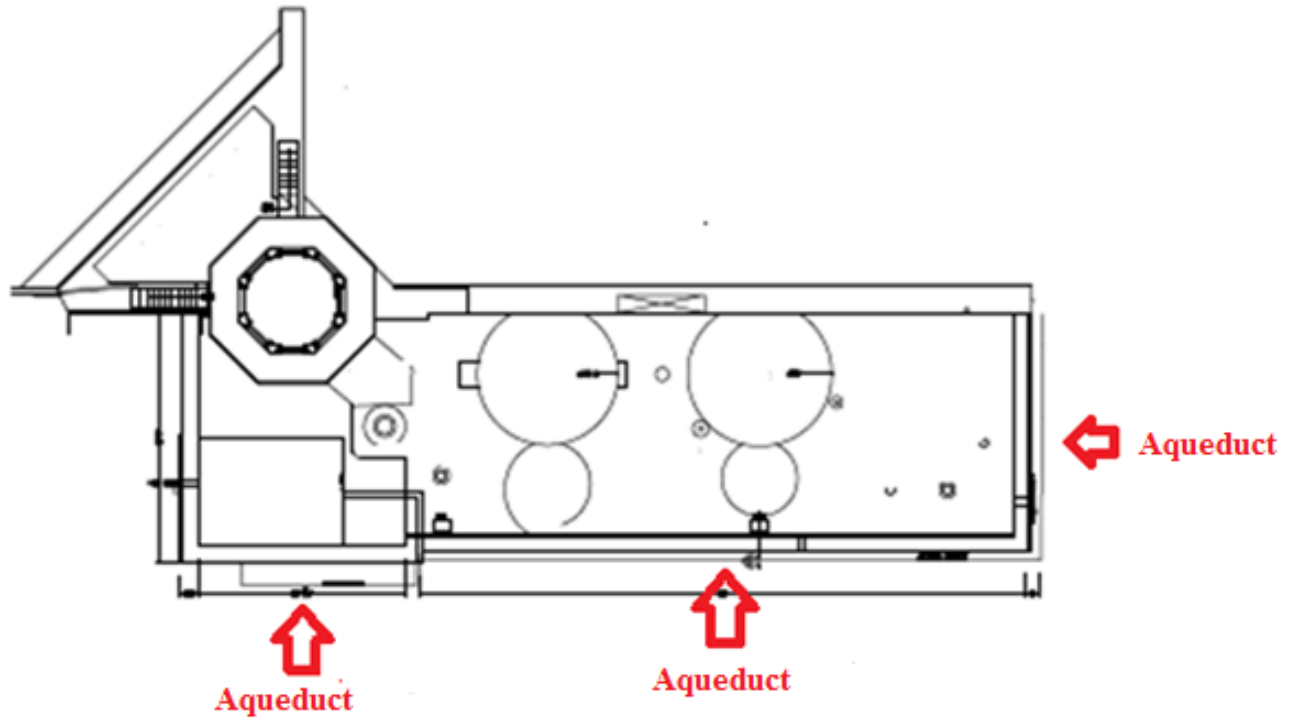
Roof Plan Showing Aqueducts Running on the Eastern and Northern Side Wall
